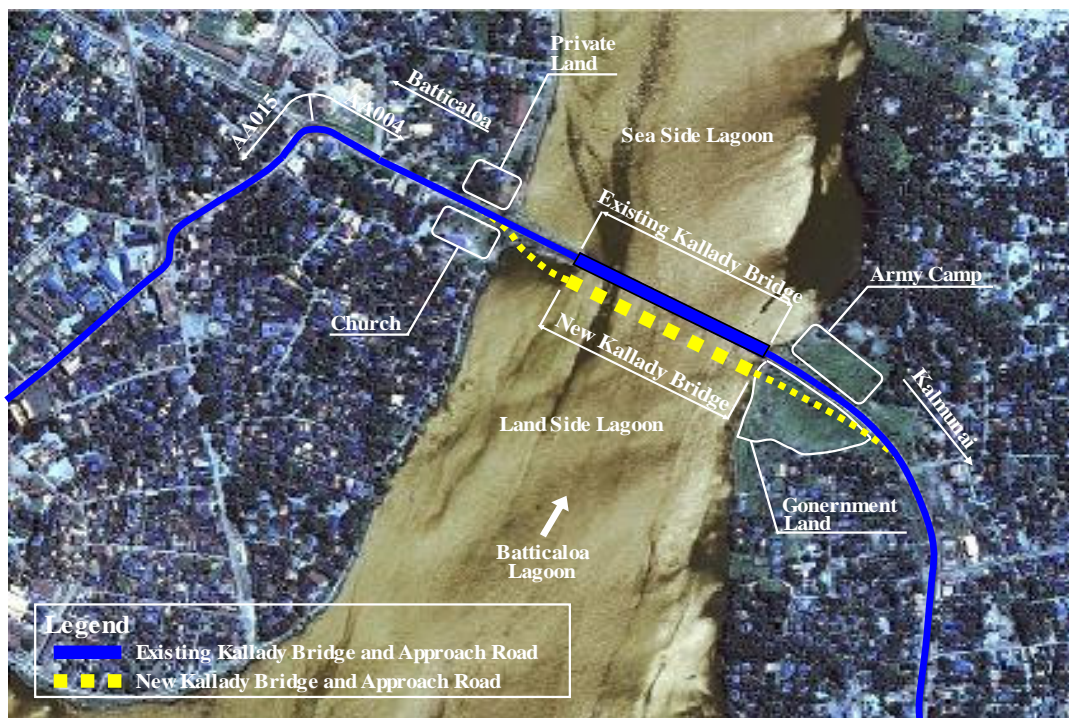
Proposed Alignment of New Kallady Bridge & Approach Roads
